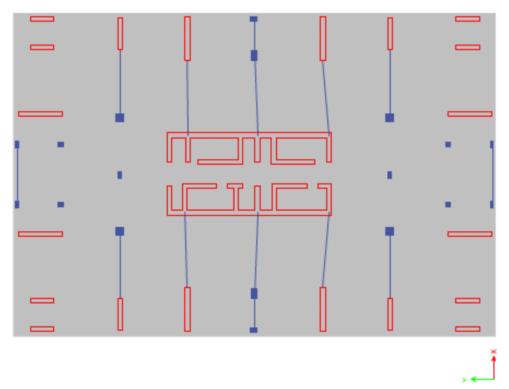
Final Residential floor plan (Sample: 40th residential floor)
